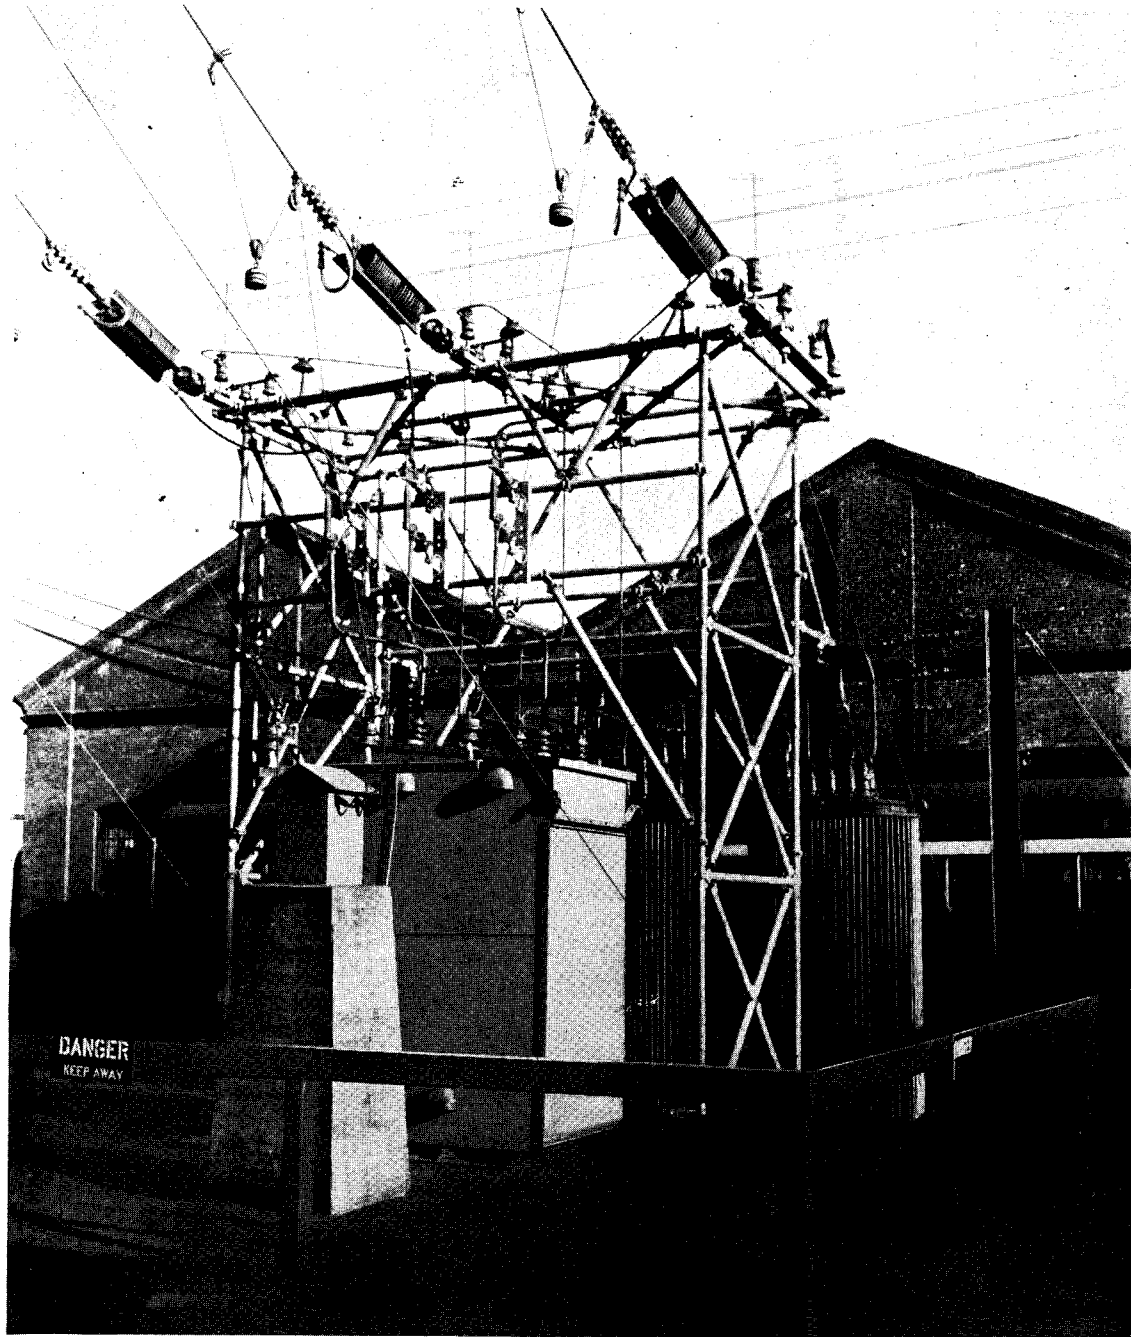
Typical outdoor pipe structure using Westinghouse pipe fittings.
